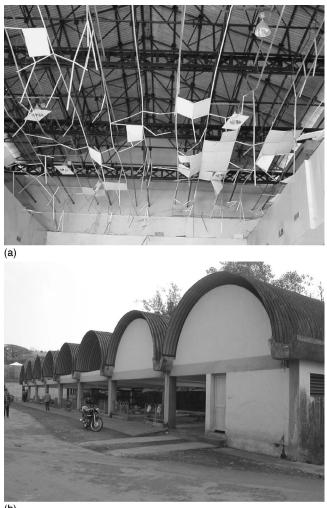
Pounding occurred between closely constructed buildings in and around Port Blair. These buildings are in the Bamboo Flat shopping complex (photo: S. Jain).
